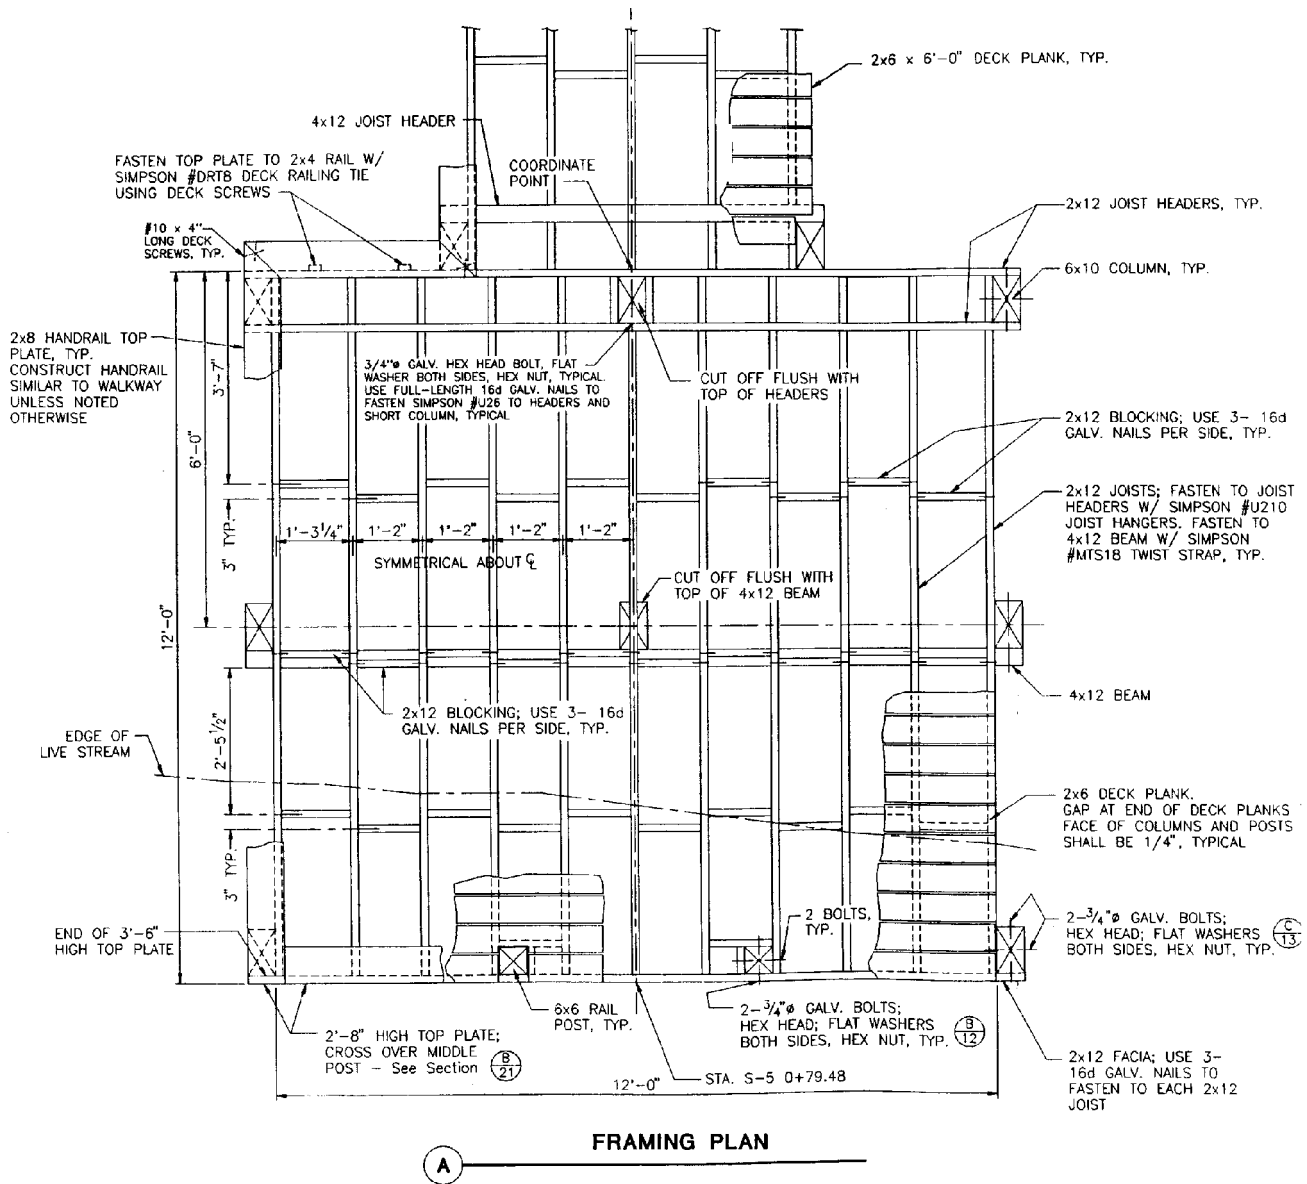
Framing details for construction of CDDC viewing platform, top view.
